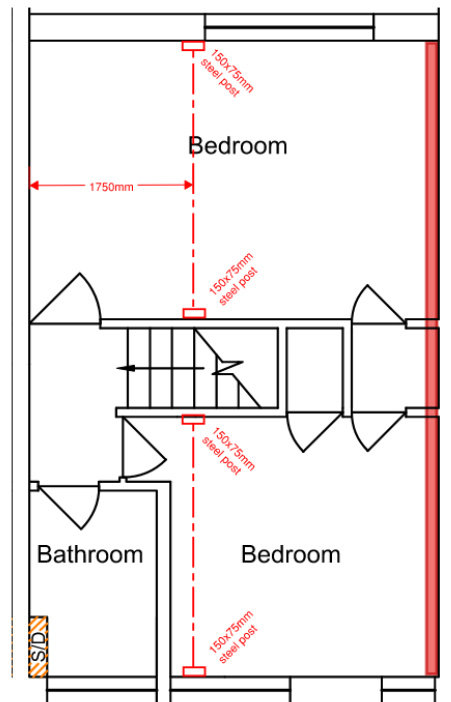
Flat 18 floor plan showing location of strengthening beams and columns
